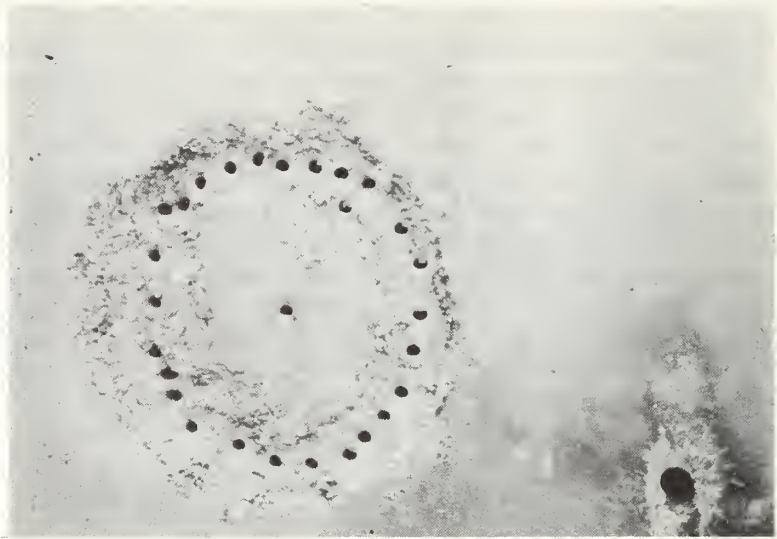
6E2. Slab 6, front view showing drilling pattern
